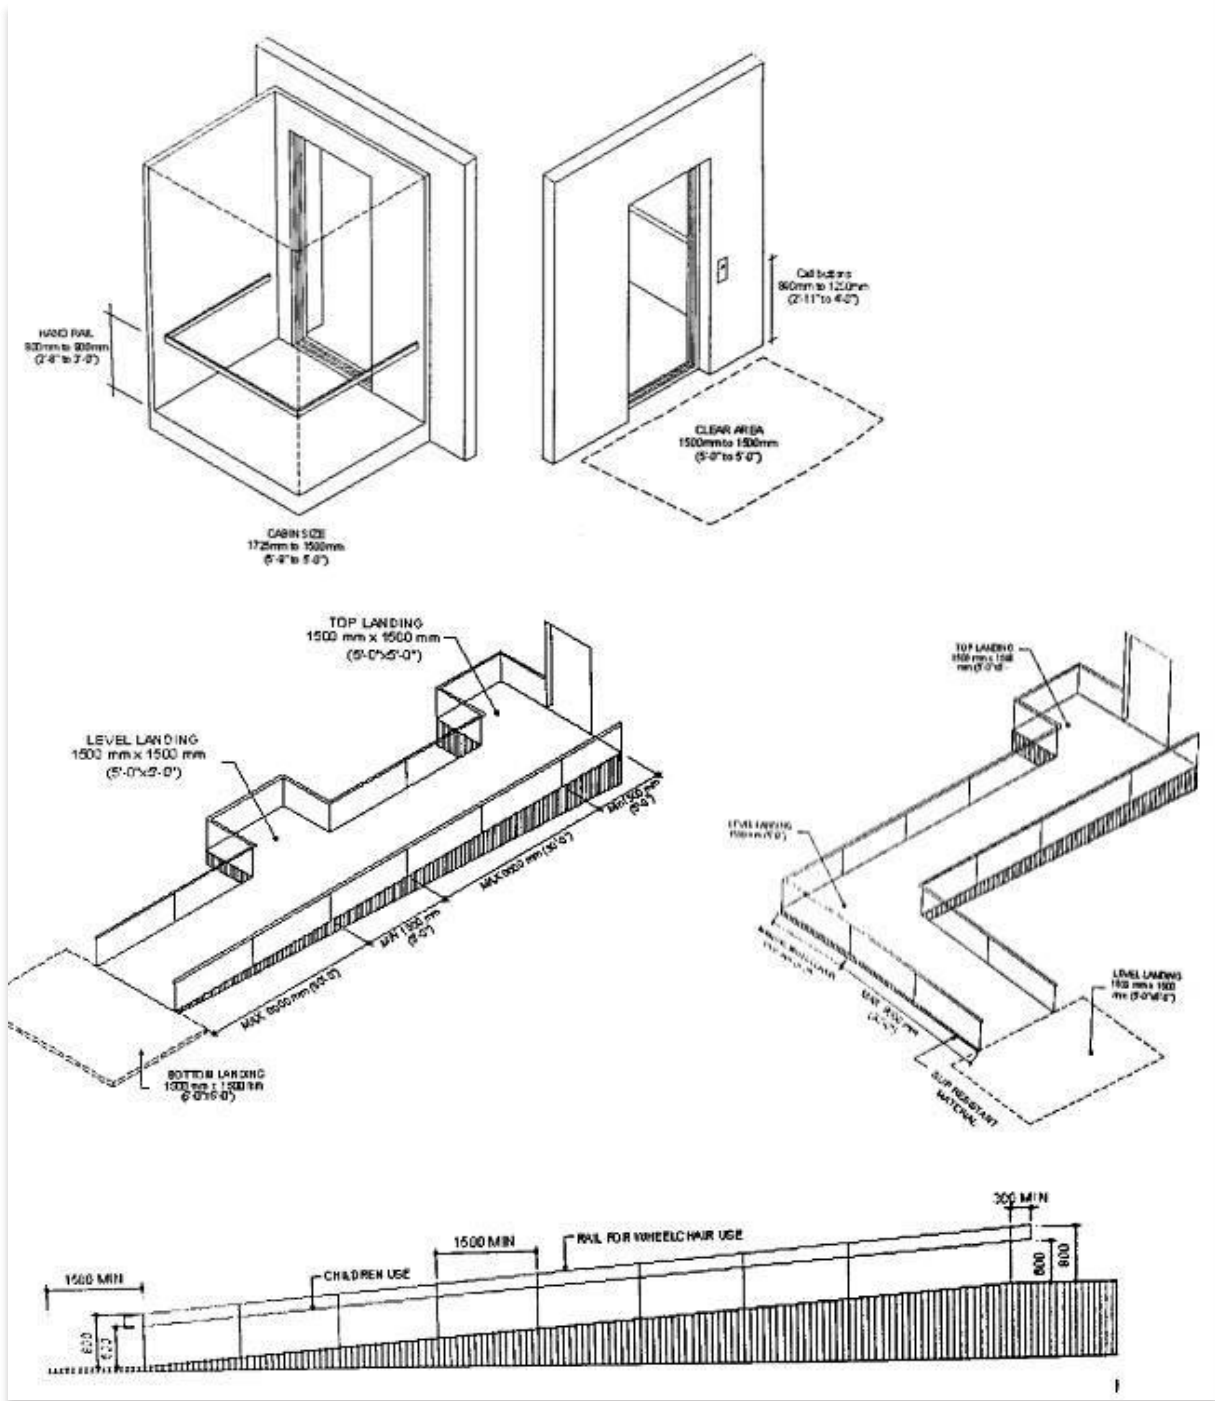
space requirements for elevators and ramps (source: Time savers standard for building types)
